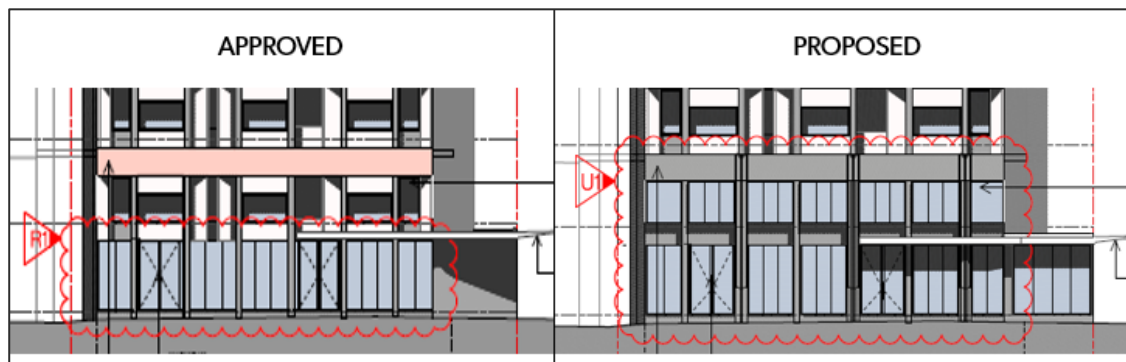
| Revised fenestration and glazing to the west elevation at Ground and Level 1 (Base source: Approved Plans MOD 7 and Applicant's Modification Report).
